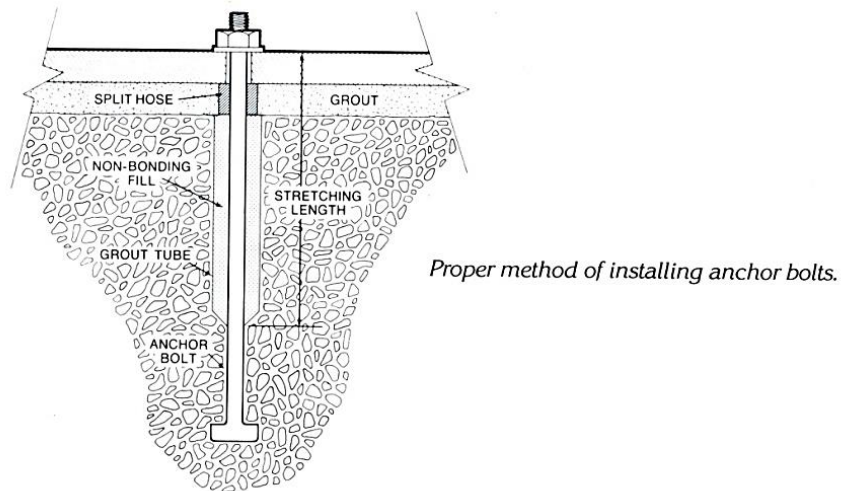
Anchor Bolt Installation Ref [9 & 38] Escoweld 7505E/7530 Machinery Grout.
